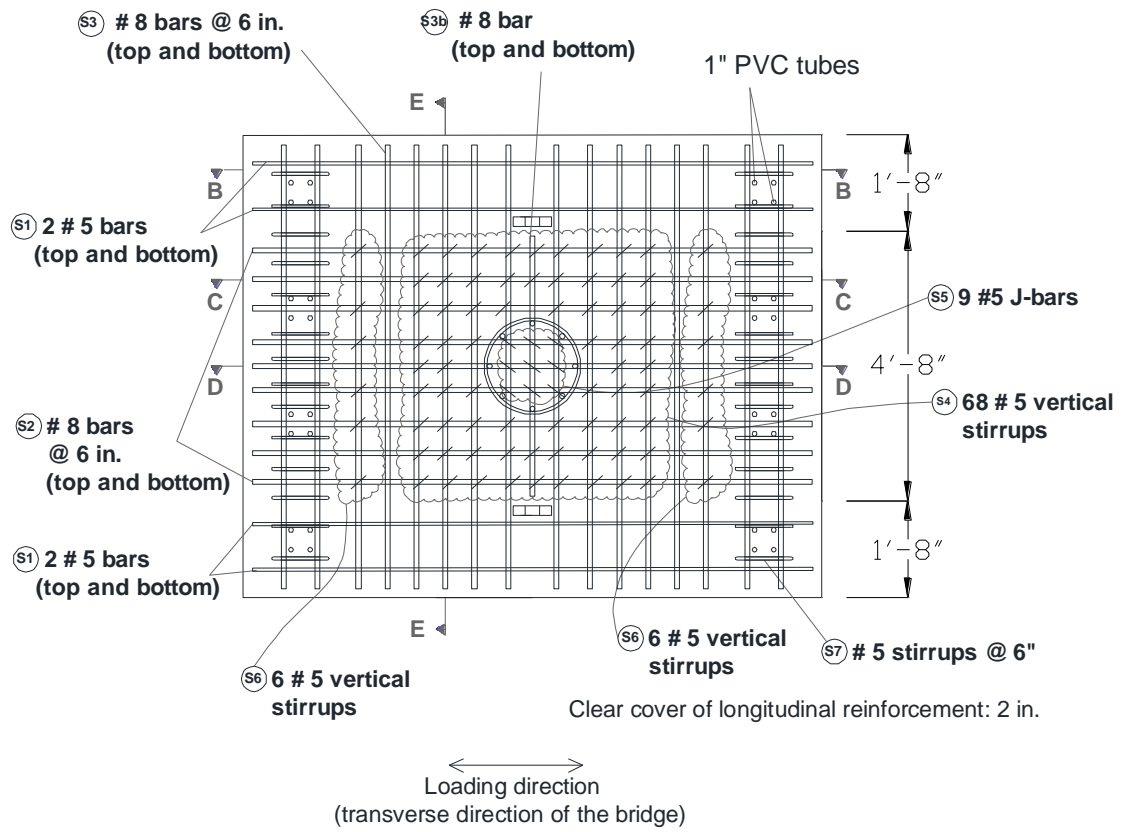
Plan view of slab reinforcement for Specimen #1
